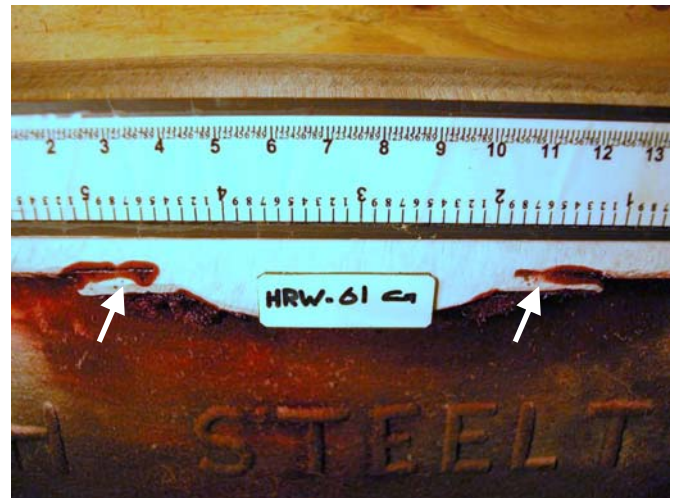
Dye Penetrant Examination of Cold Lapping under the Railhead of the 1/8-inch Depth Orgo-Thermit Weld. Arrows indicate the locations of cold lapping.
